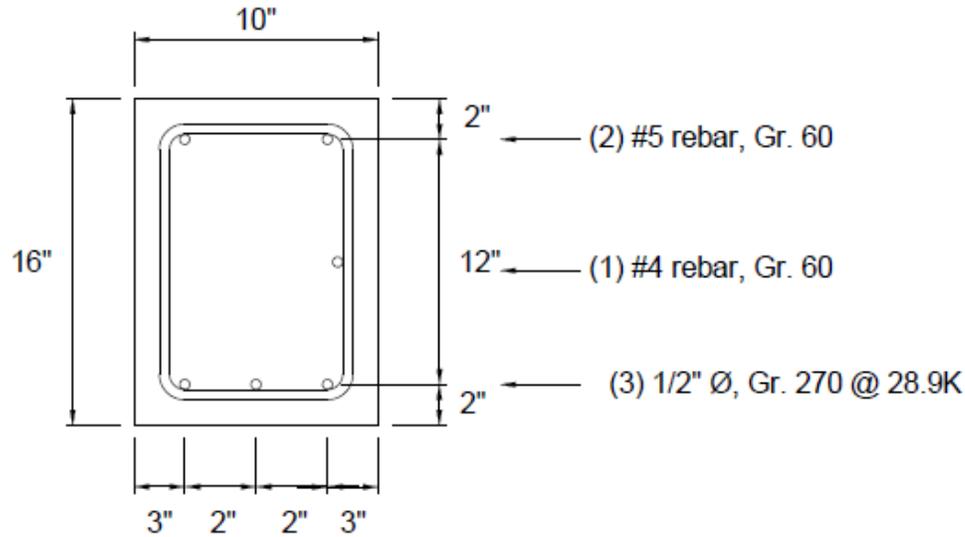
Typical cross section of prestressed, precast concrete beams.
